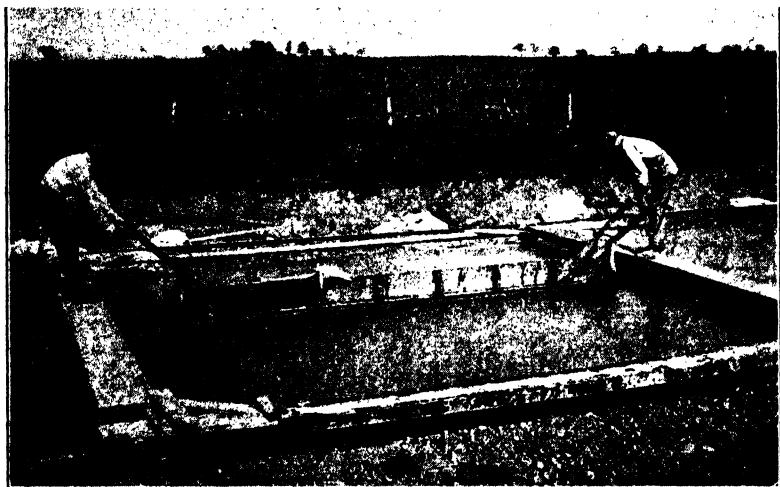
A longitudinal float used to correct transverse waves left by the strike board. The strike board is similar in design but is curved to the crown of the pavement and is used transversely to shape and compact the concrete.
